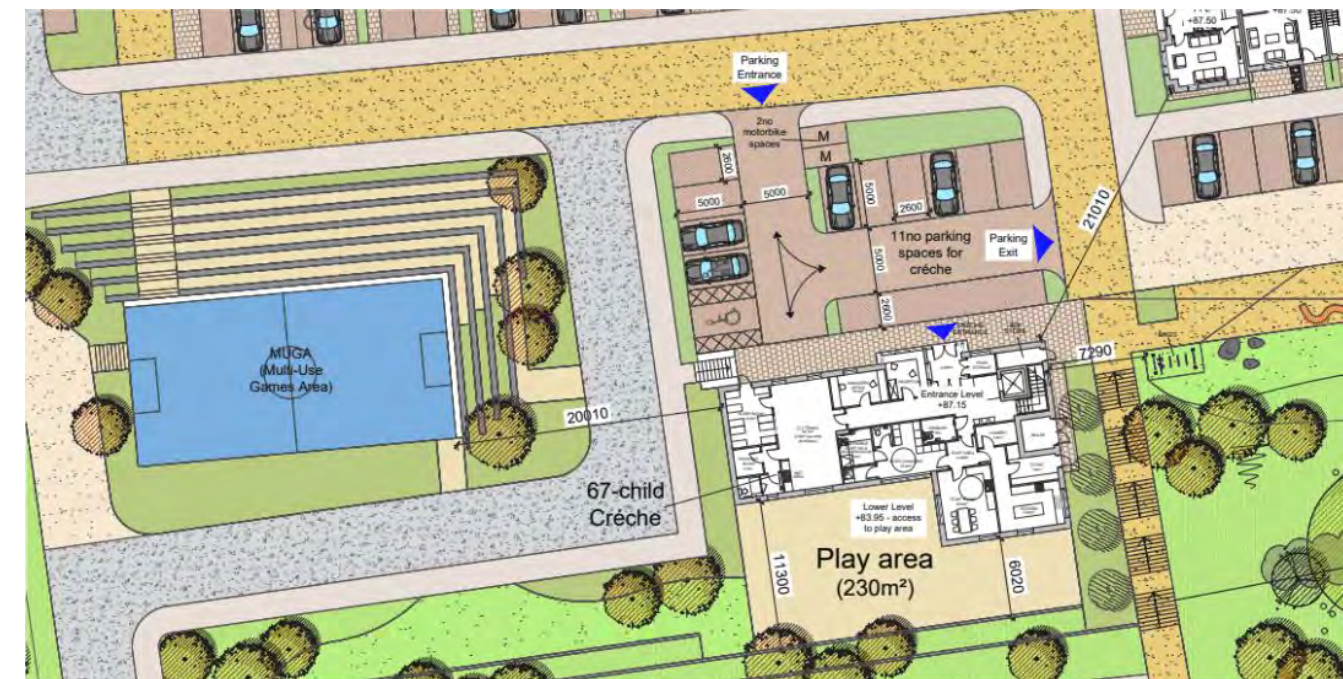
Alternative C - Site Plan Extract - Showing Street Hierarchy Strategy
